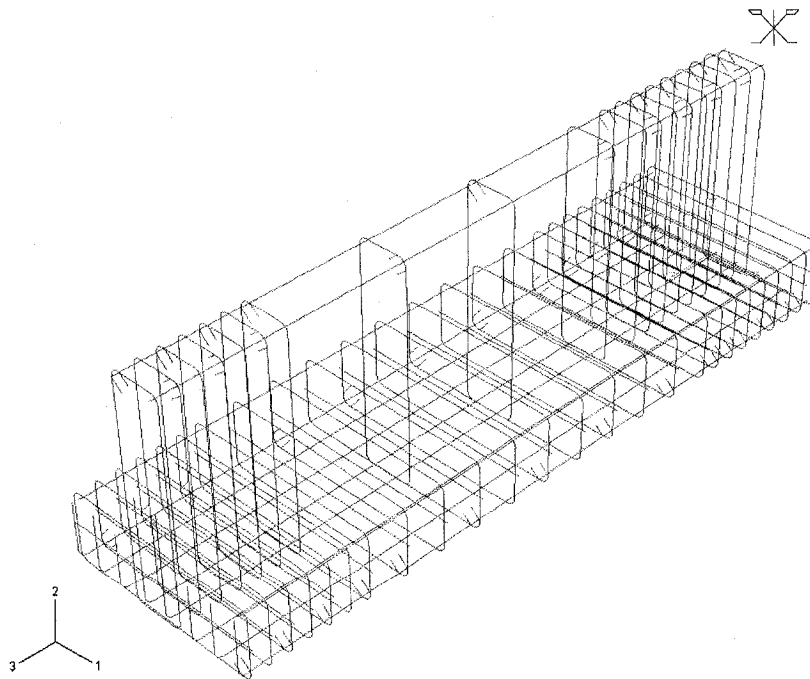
Finite element model – Steel reinforcement for girder IT-G1, IT-G2 (half specimen)
